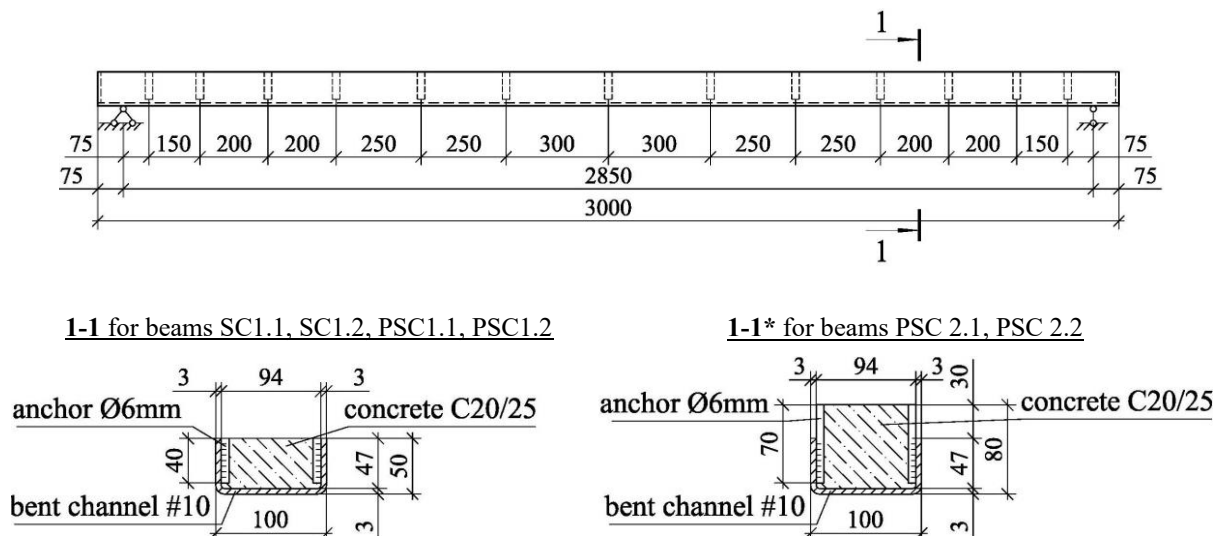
Geometrical parameters of experimental single-span reinforced concrete girders
